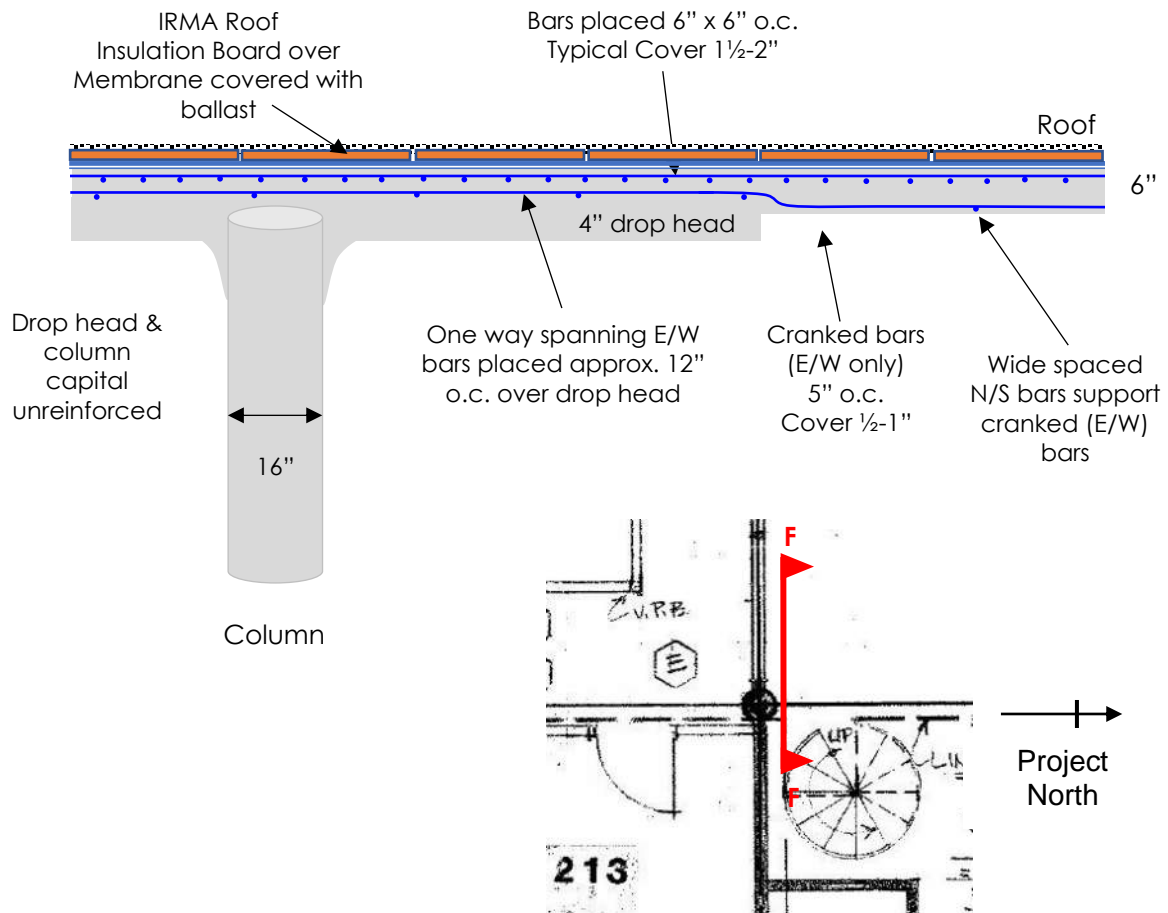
Schematic Section F-F showing Roof Slab arrangement (using GPR data from Areas 7 & 8)
